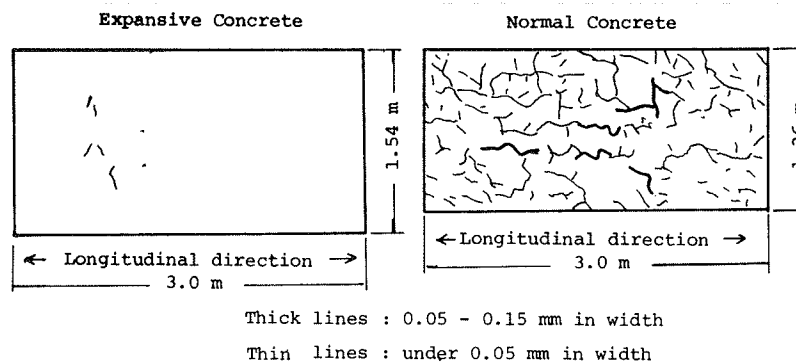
State of cracks on bottom surface of bridge deck 700 days after construction.
